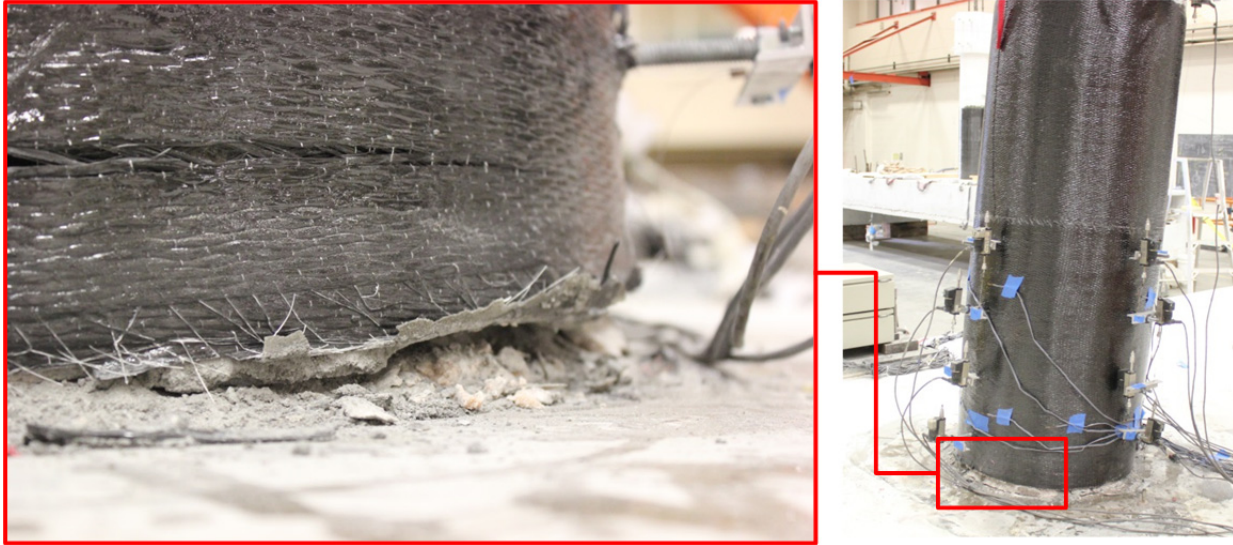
Circumferential tear in the CFRP jacket and cracking at the column-bent cap interface as lateral loading progressed.
